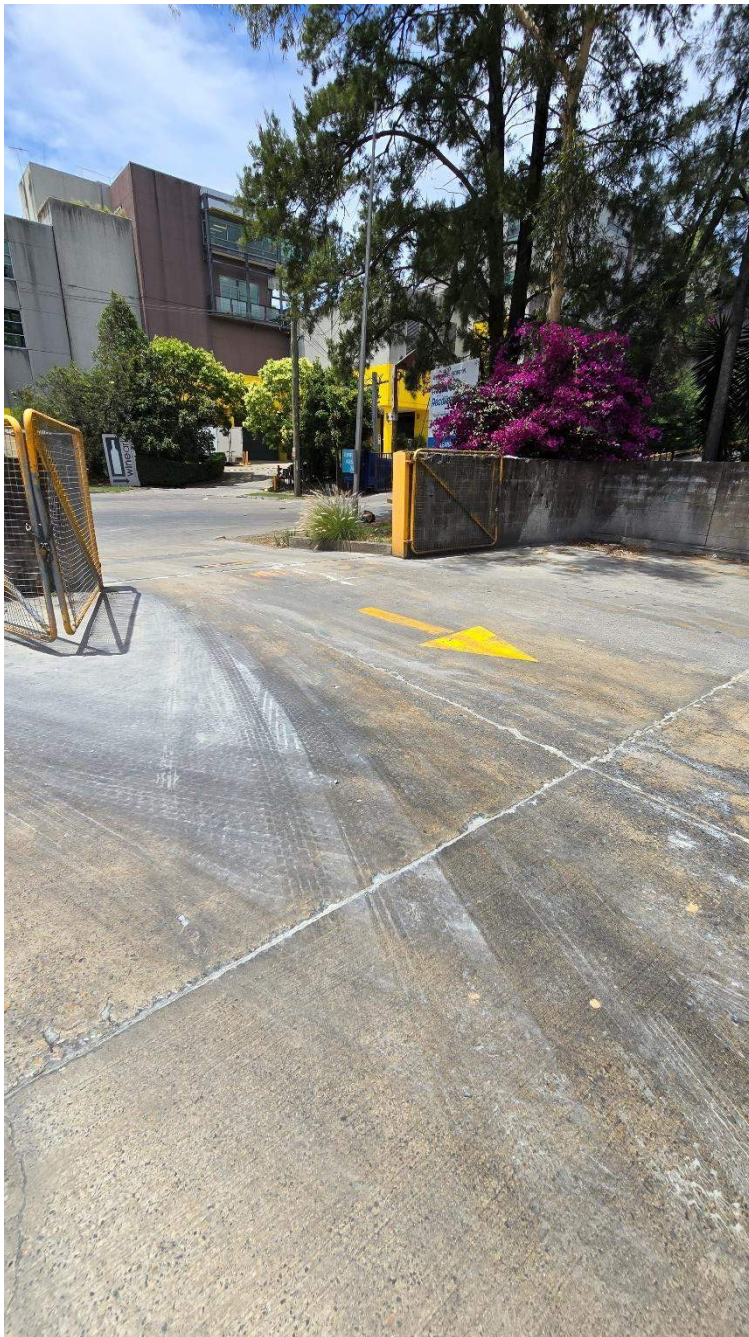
Cracks observed (40, 41, 42, 43, 44) - Concrete cracks throughout area
